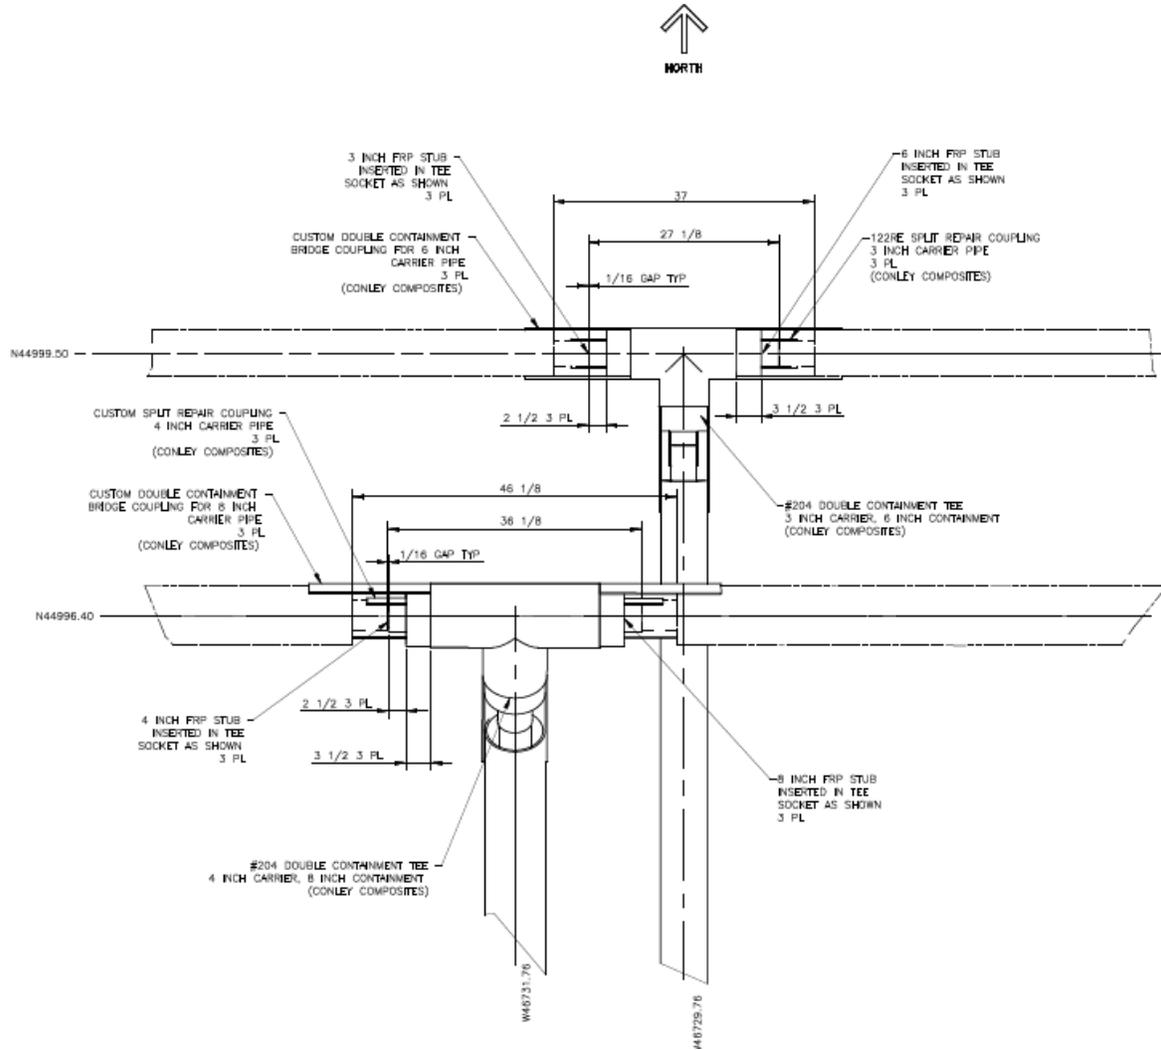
LERF Basin 41 Piping Detail-H (H-2-838765, Sheet 3)
